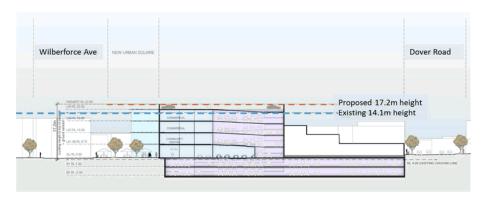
Section of maximum building heights between Wilberforce Avenue and Dover Road
